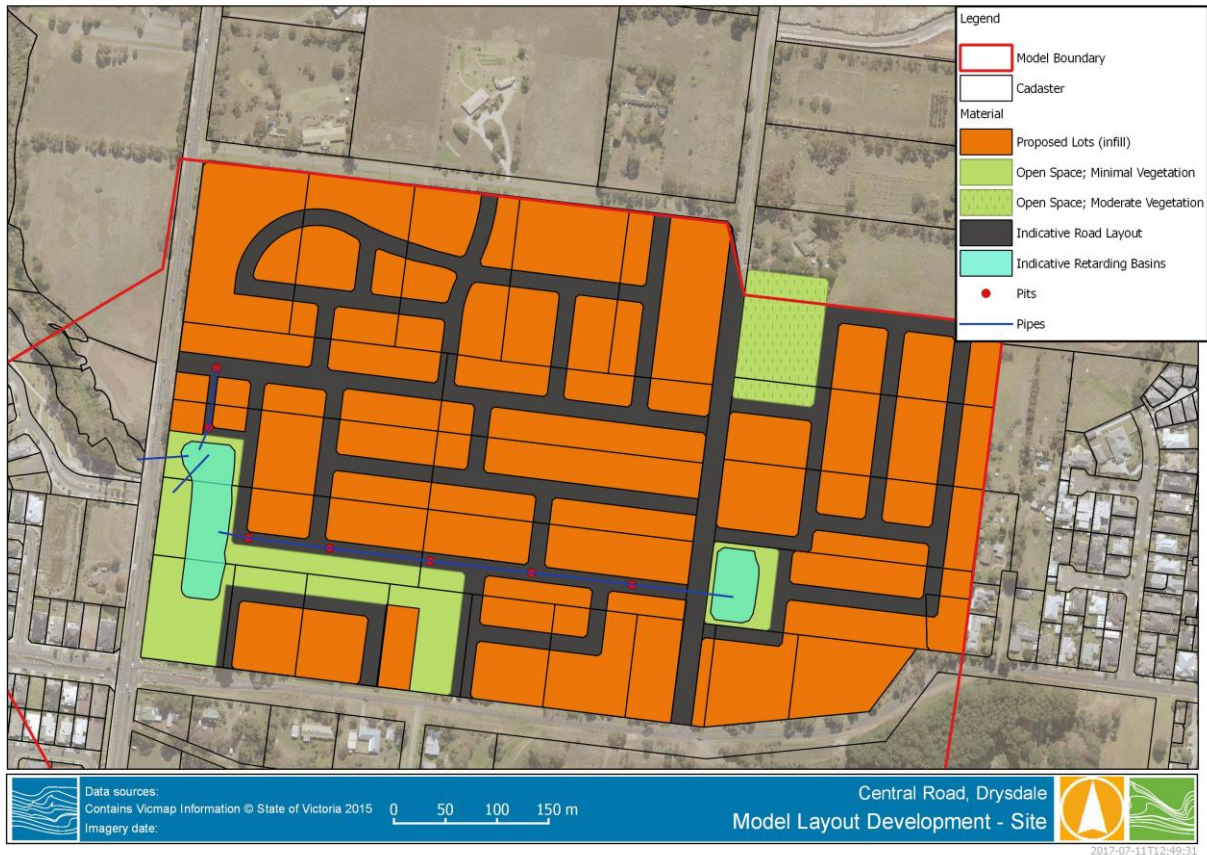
Indicative Retarding Basin Layouts and Locations
